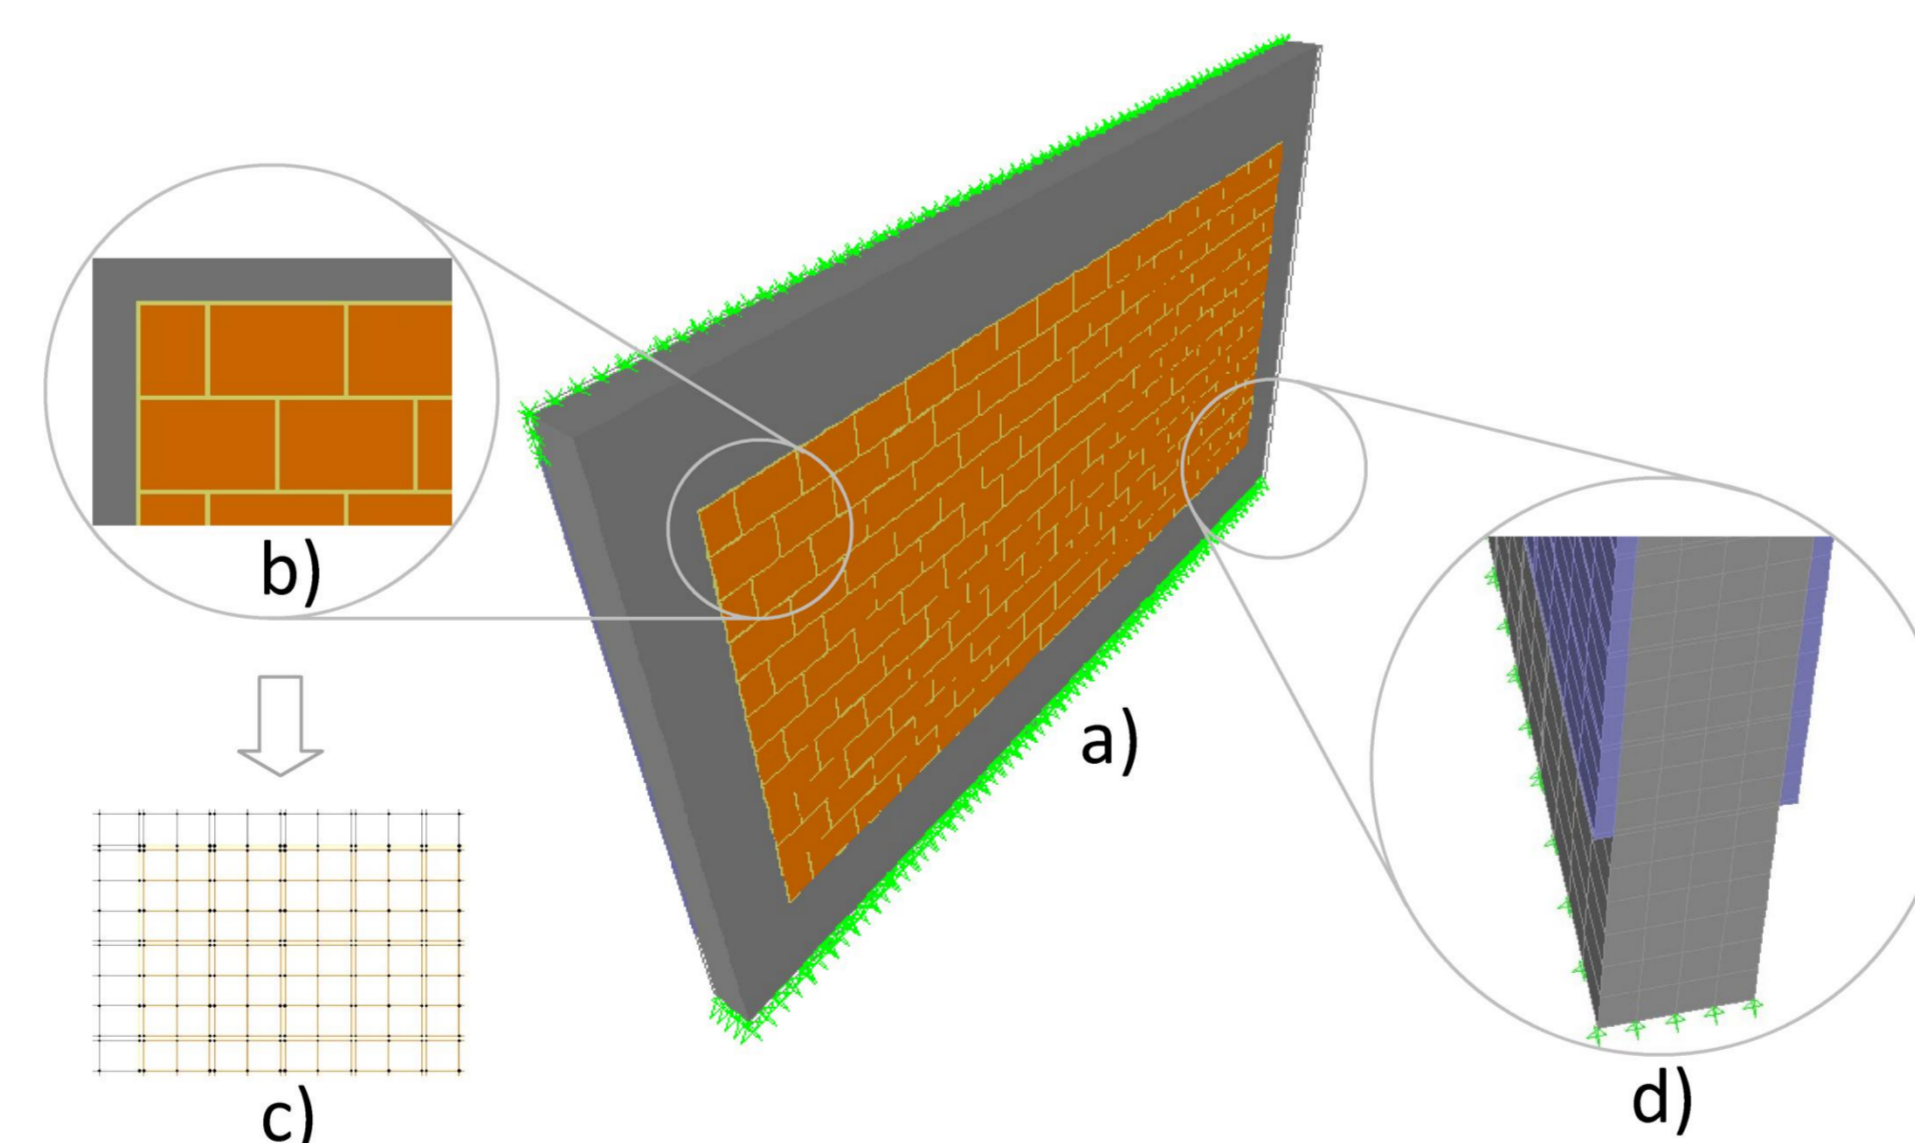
Finite-element wall model. a) Global view, b) detail of brick-concrete and brick-brick interfaces, c) detail of FEM mesh, d) detail of cement render (in blue).
